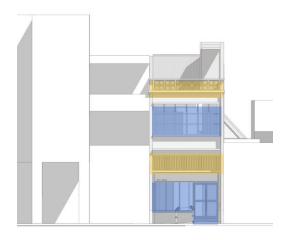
Schematic diagram of facade structure Source: Author's own drawing
